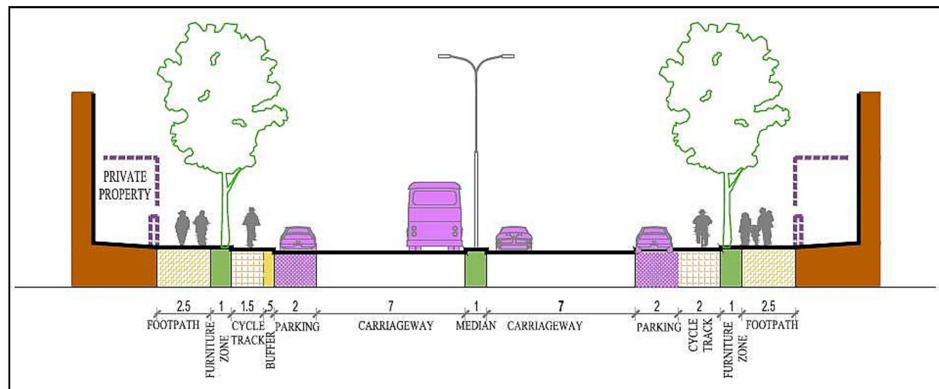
Street design proposal for 30 m wide road with footpath, cycle track, parking space and traffic carriageway
